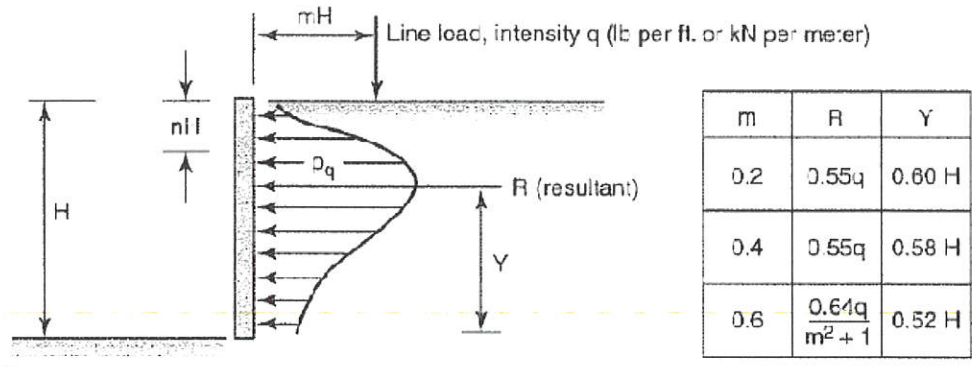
Pressure distribution against vertical wall resulting from line load of intensity q.
